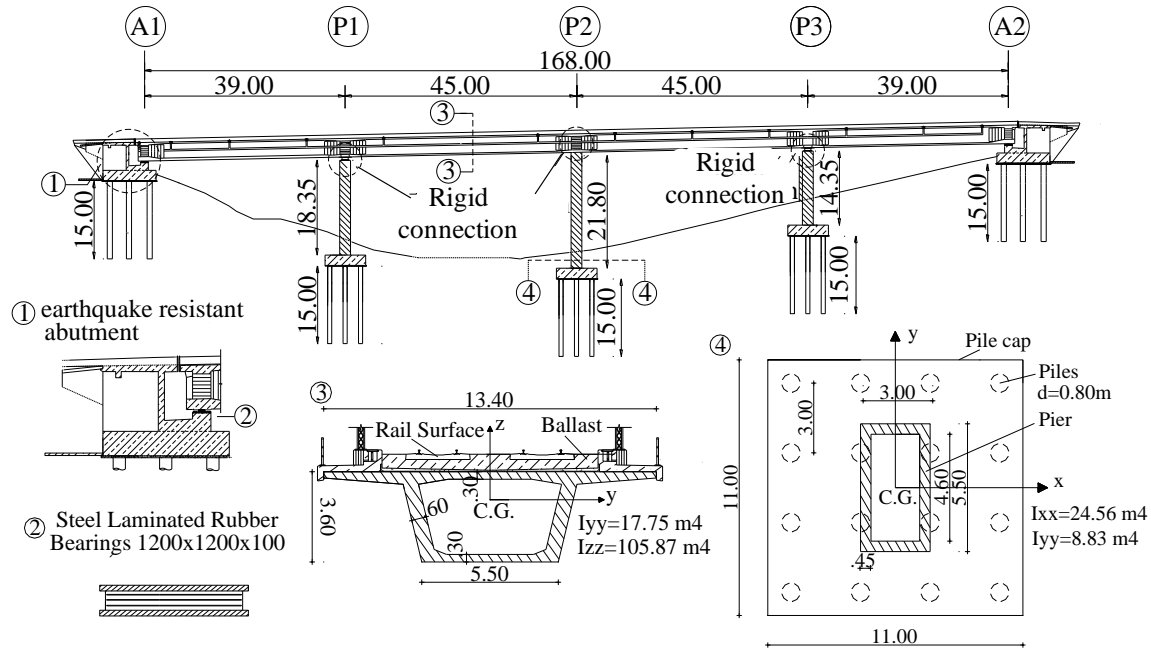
Section details along the bridge span: (1) Bridge abutment; (2) steel laminated rubber bearings; (3) deck cross-section; (4) plan view of the pier and its foundation.
